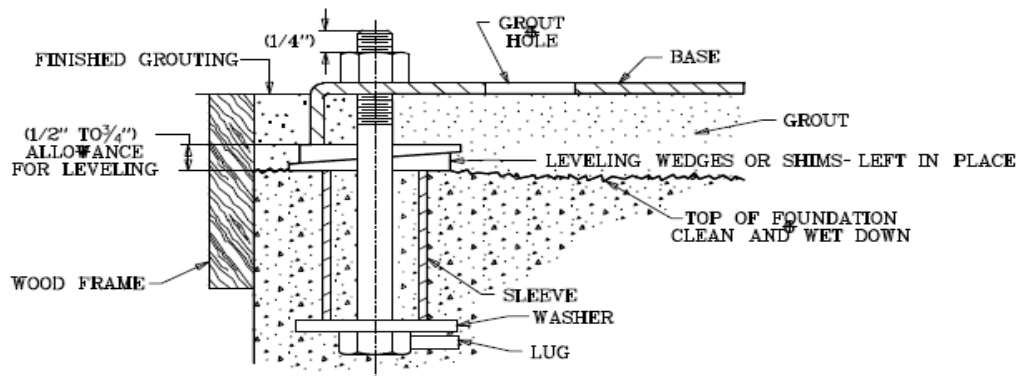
TYPICAL FOUNDATION BOLT DESIGN
